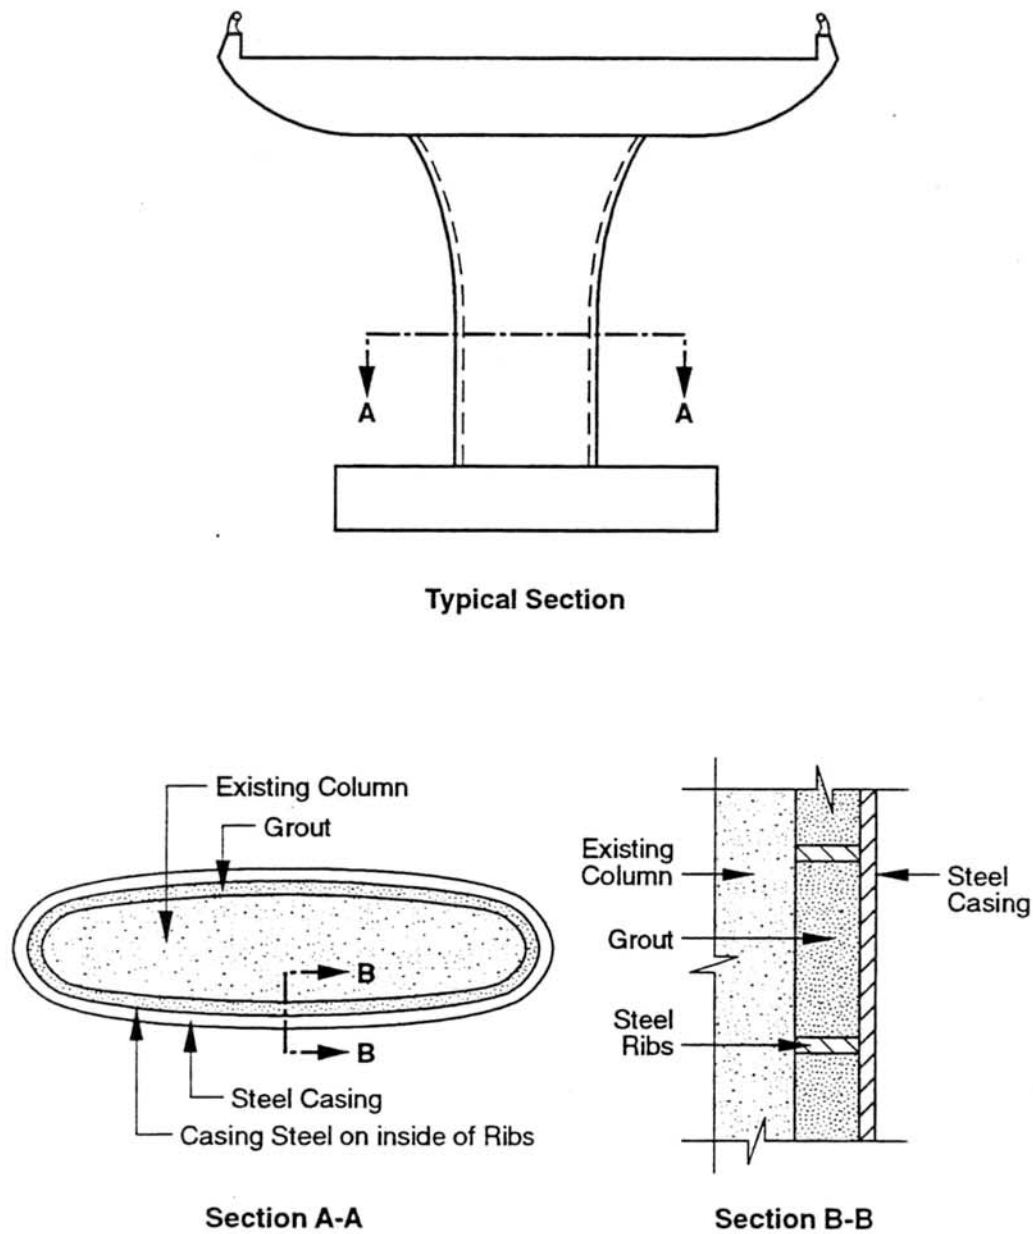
Proposed Detail for Eliminating Exposed Ribs
